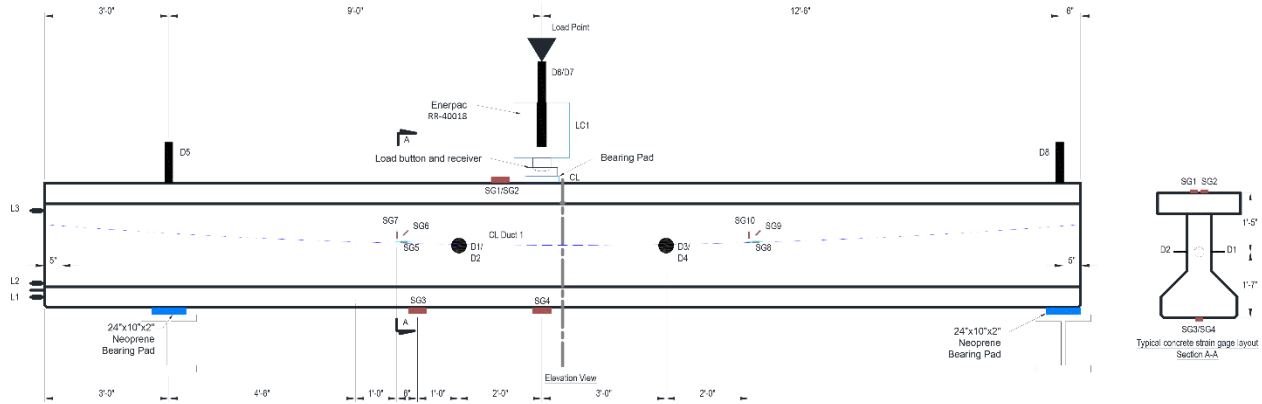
Typical instrumentation layout for phase 1 specimens
